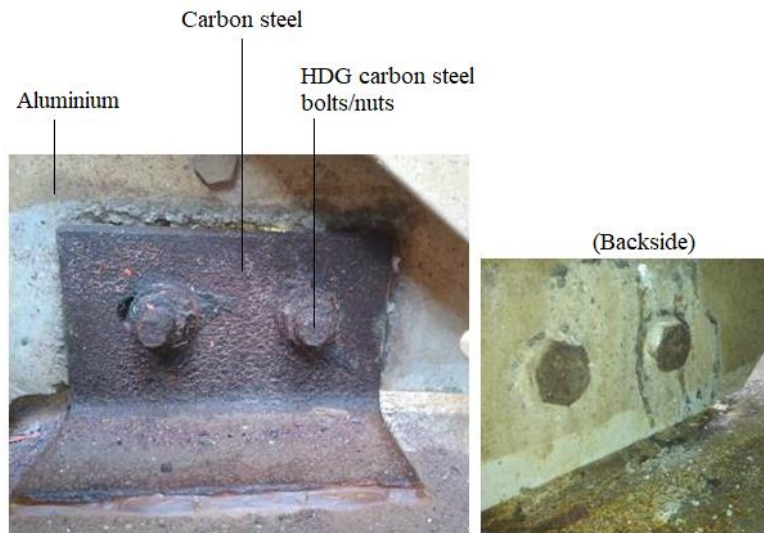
Corrosion of aluminium connected to carbon steel without insulation.
